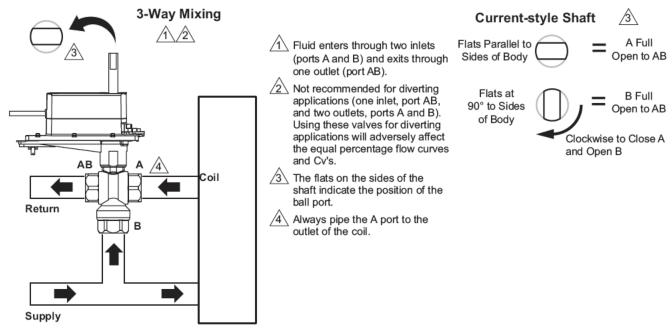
3-Way Mixing Valve Assemblies Piping Diagram.
